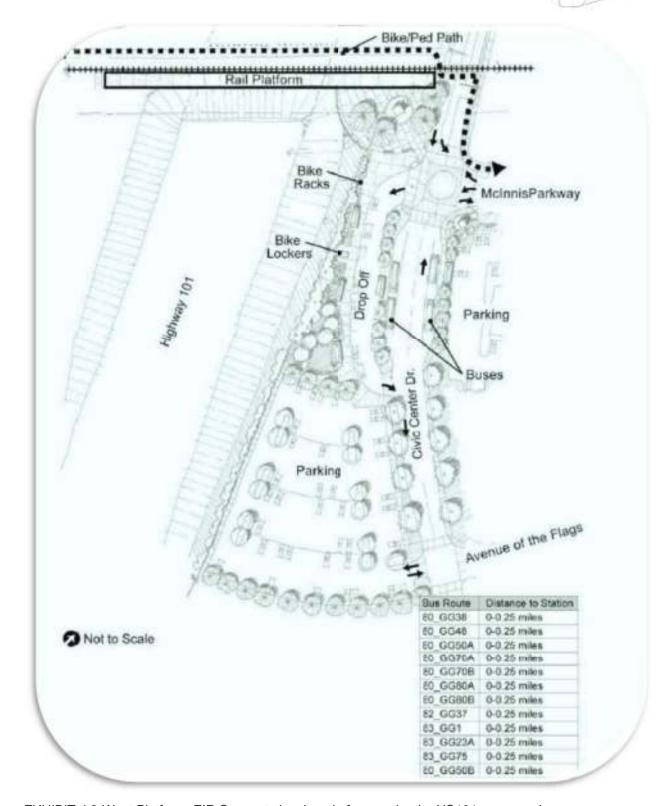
West Platform: EIR Concept showing platform under the US101 overcrossing
